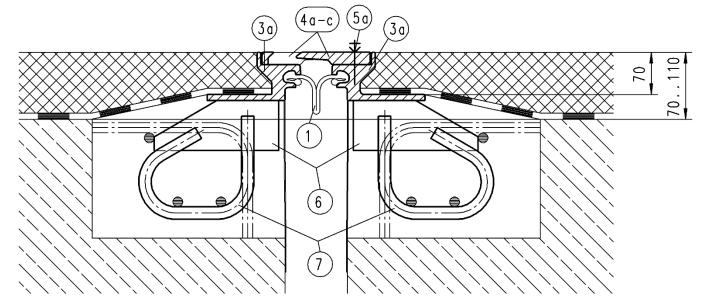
Exemplary cross section of the nosing expansion joint MAURER XC1 Expansion Joint with edge profile XC1/70 including anchorage, pavement thickness 70 mm
